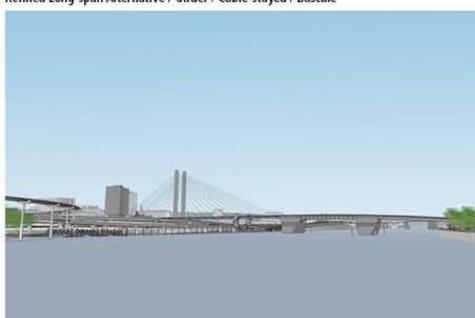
Visual Impacts – View from Steel Bridge looking south – Cont.
